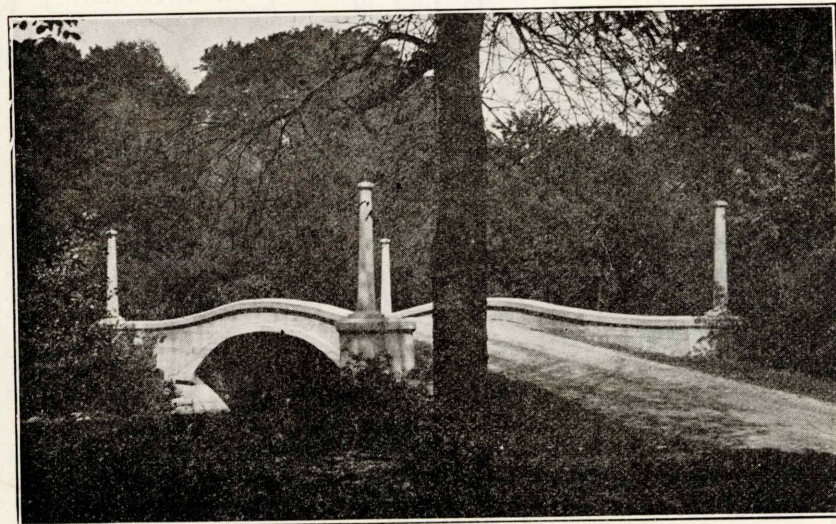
The bridge in East Park. Due to faulty street arrangement, this bridge carries much traffic that should not pass through the park.
